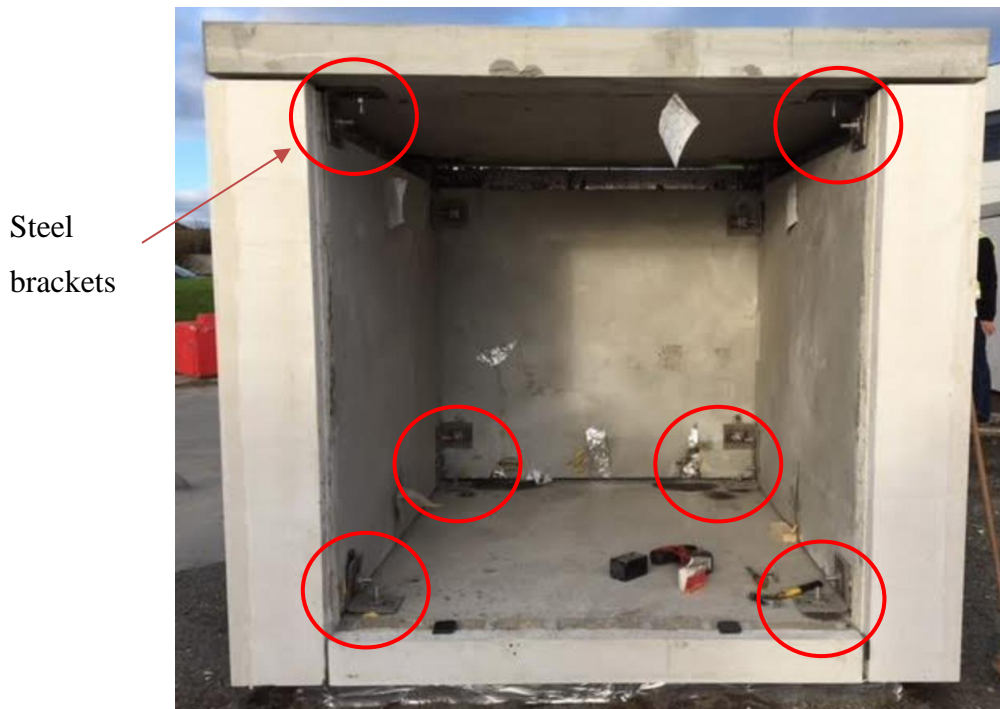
Erection of the PCM demonstration hut prior to installation of the glazed sliding doors displaying the fixings between floors, roof and wall panels
